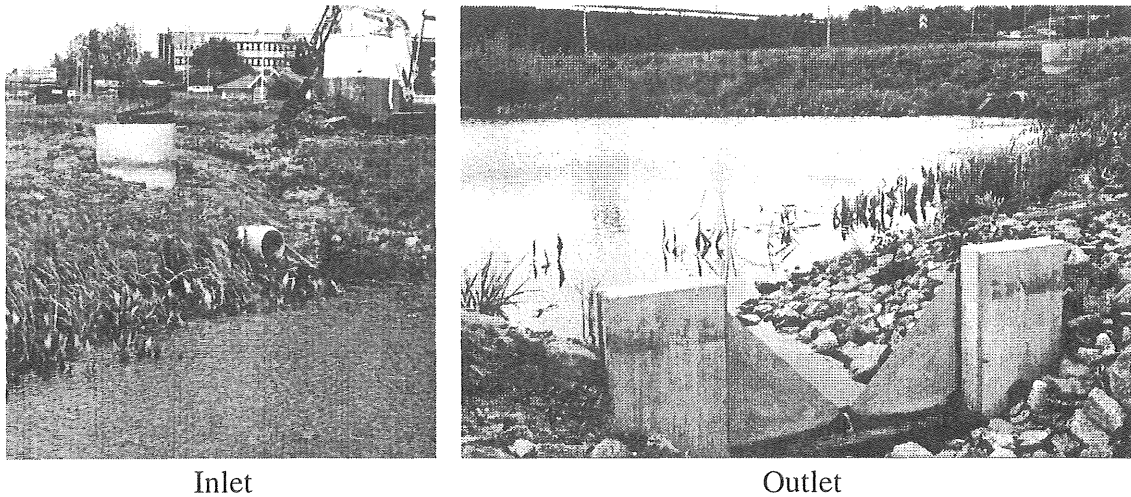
Inlet and outlet facilities at the Järnbrott detention pond.
